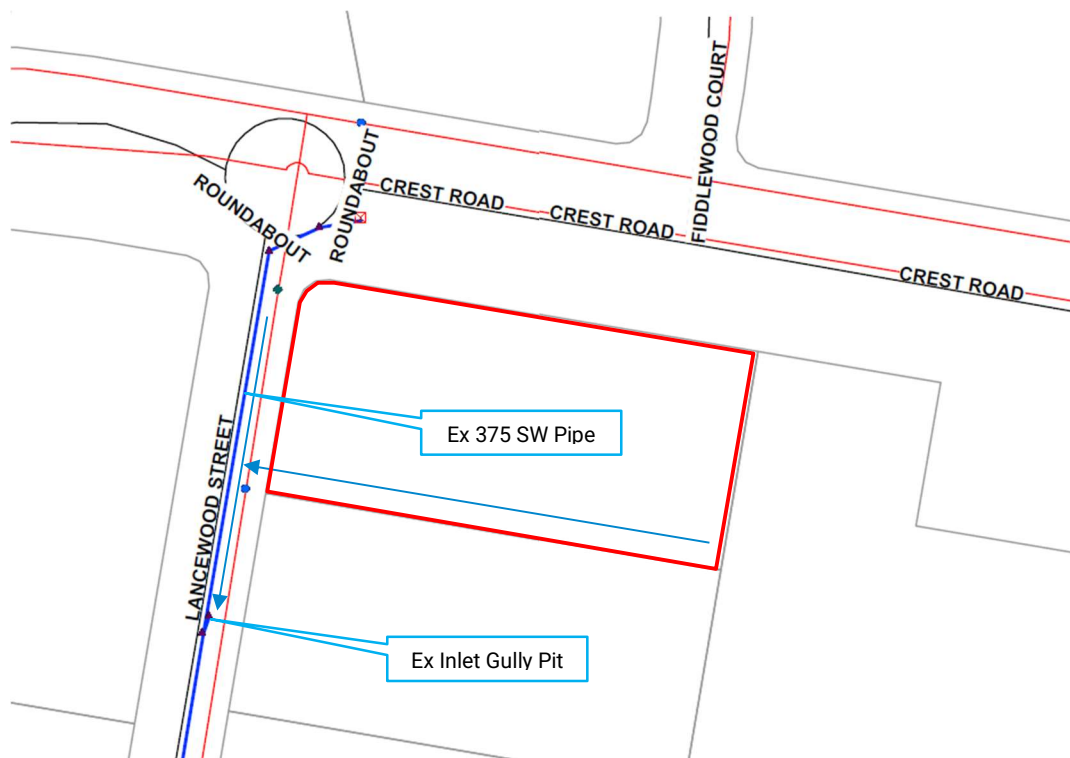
Existing stormwater infrastructure (LCC DBYD)
